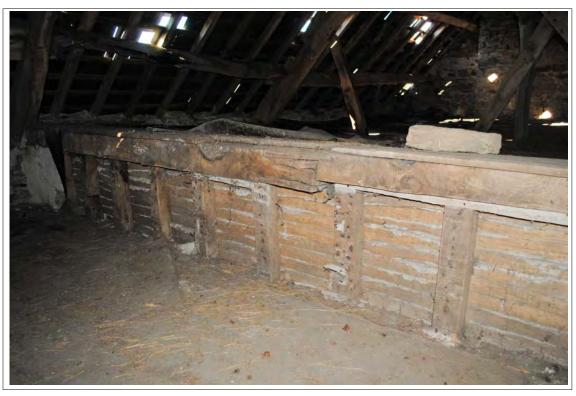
Oblique view of the stud wall extending into loft (top of the eastern wall of Room 4a). Looking southwest.
